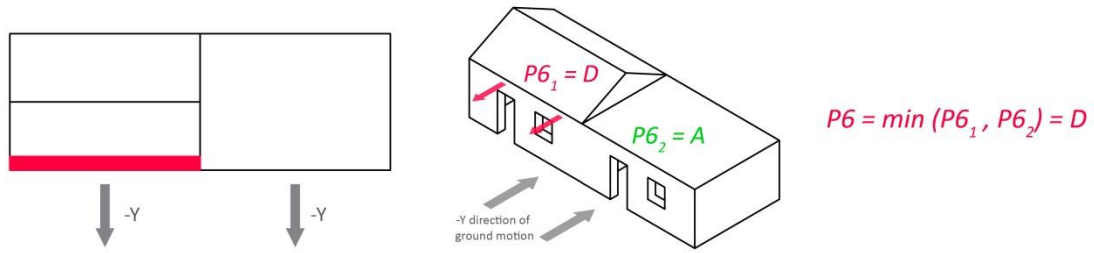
In the case of different types of roof along the building, the worst class should be adopted (plan and 3D view)
